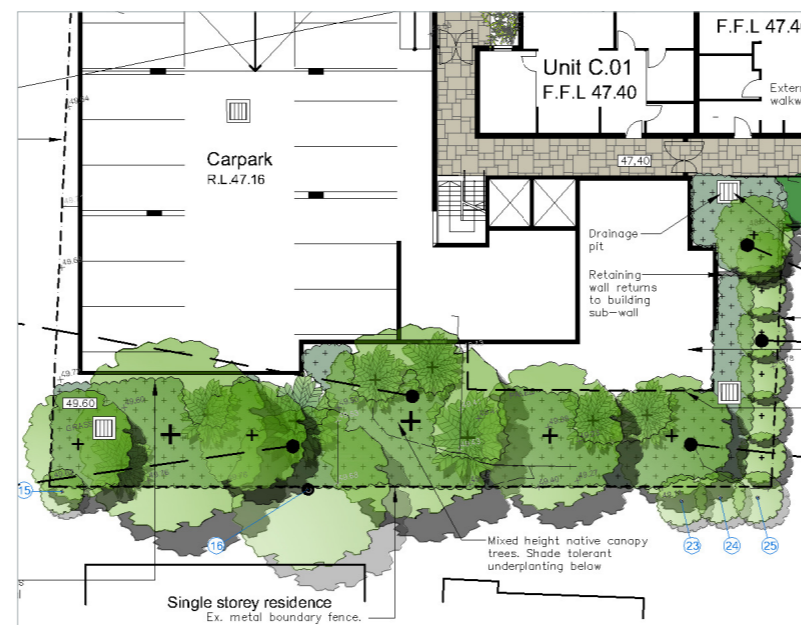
PLANTING WILL PROVIDE A BUFFER FOR EXISTING DWELLINGS
